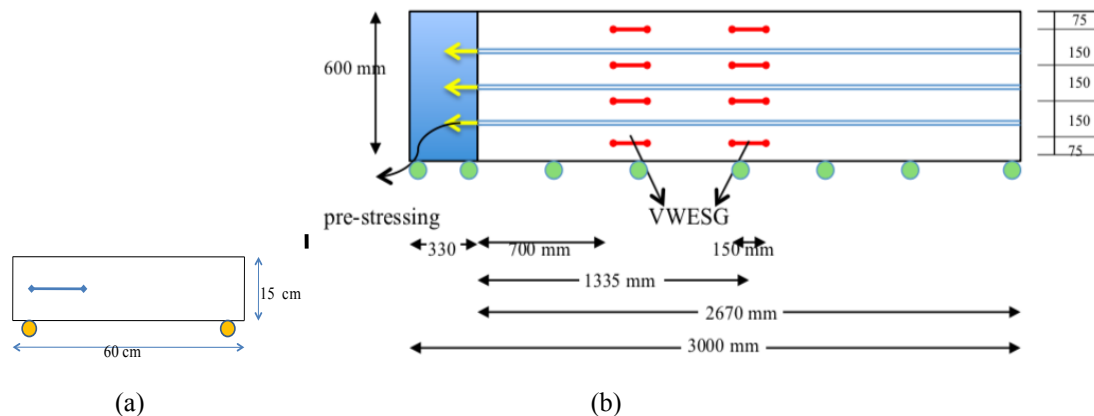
(a) Laboratory size specimen; (b) Full scale specimen
